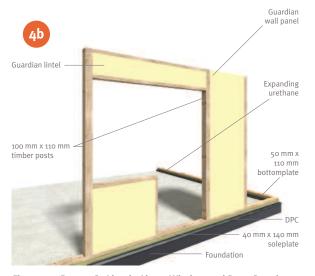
Beams Or Lintels Above Window and Door Openings – Cross Section
